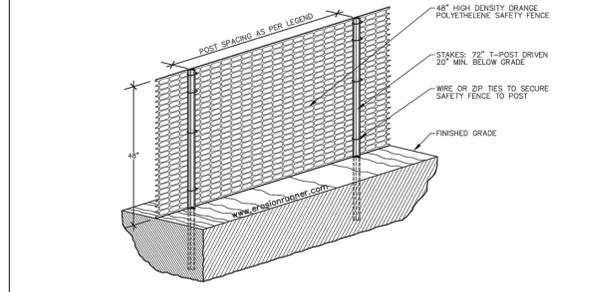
ORANGE CONSTRUCTION FENCING
